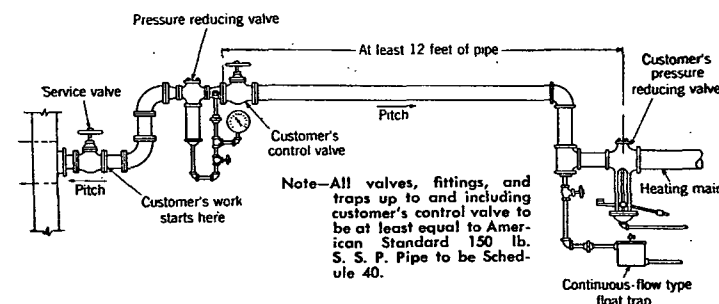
STEAM SUPPLY CONNECTION WHEN USING TWO REDUCING VALVES
